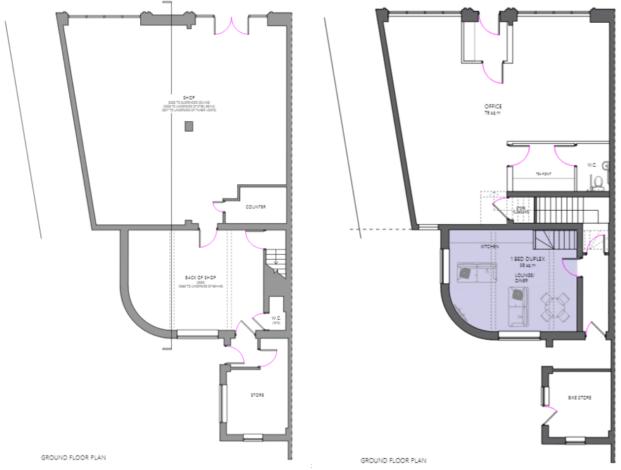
existing (left) and proposed (right) ground floor plans showing the area of commercial use to be lost(purple)
